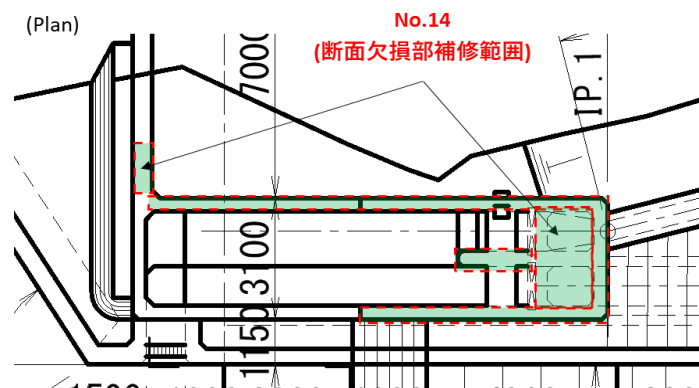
Rehabilitation Plan from No.13 to No.14
